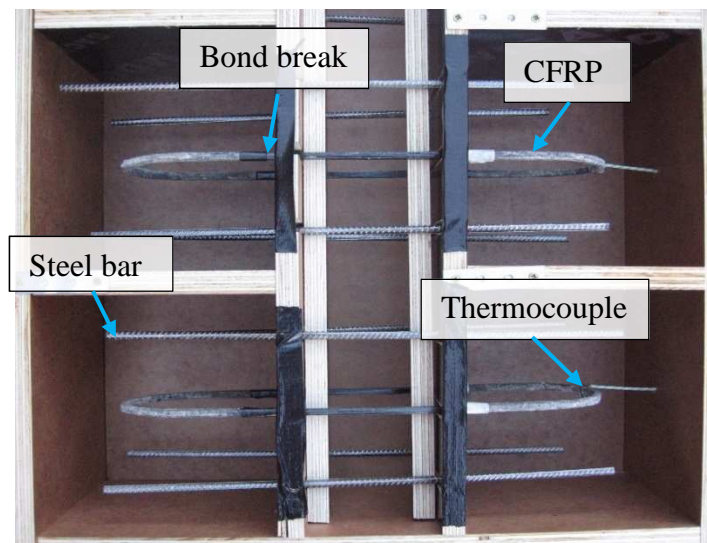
Part of the formwork specimen of Group H prior to casting.
